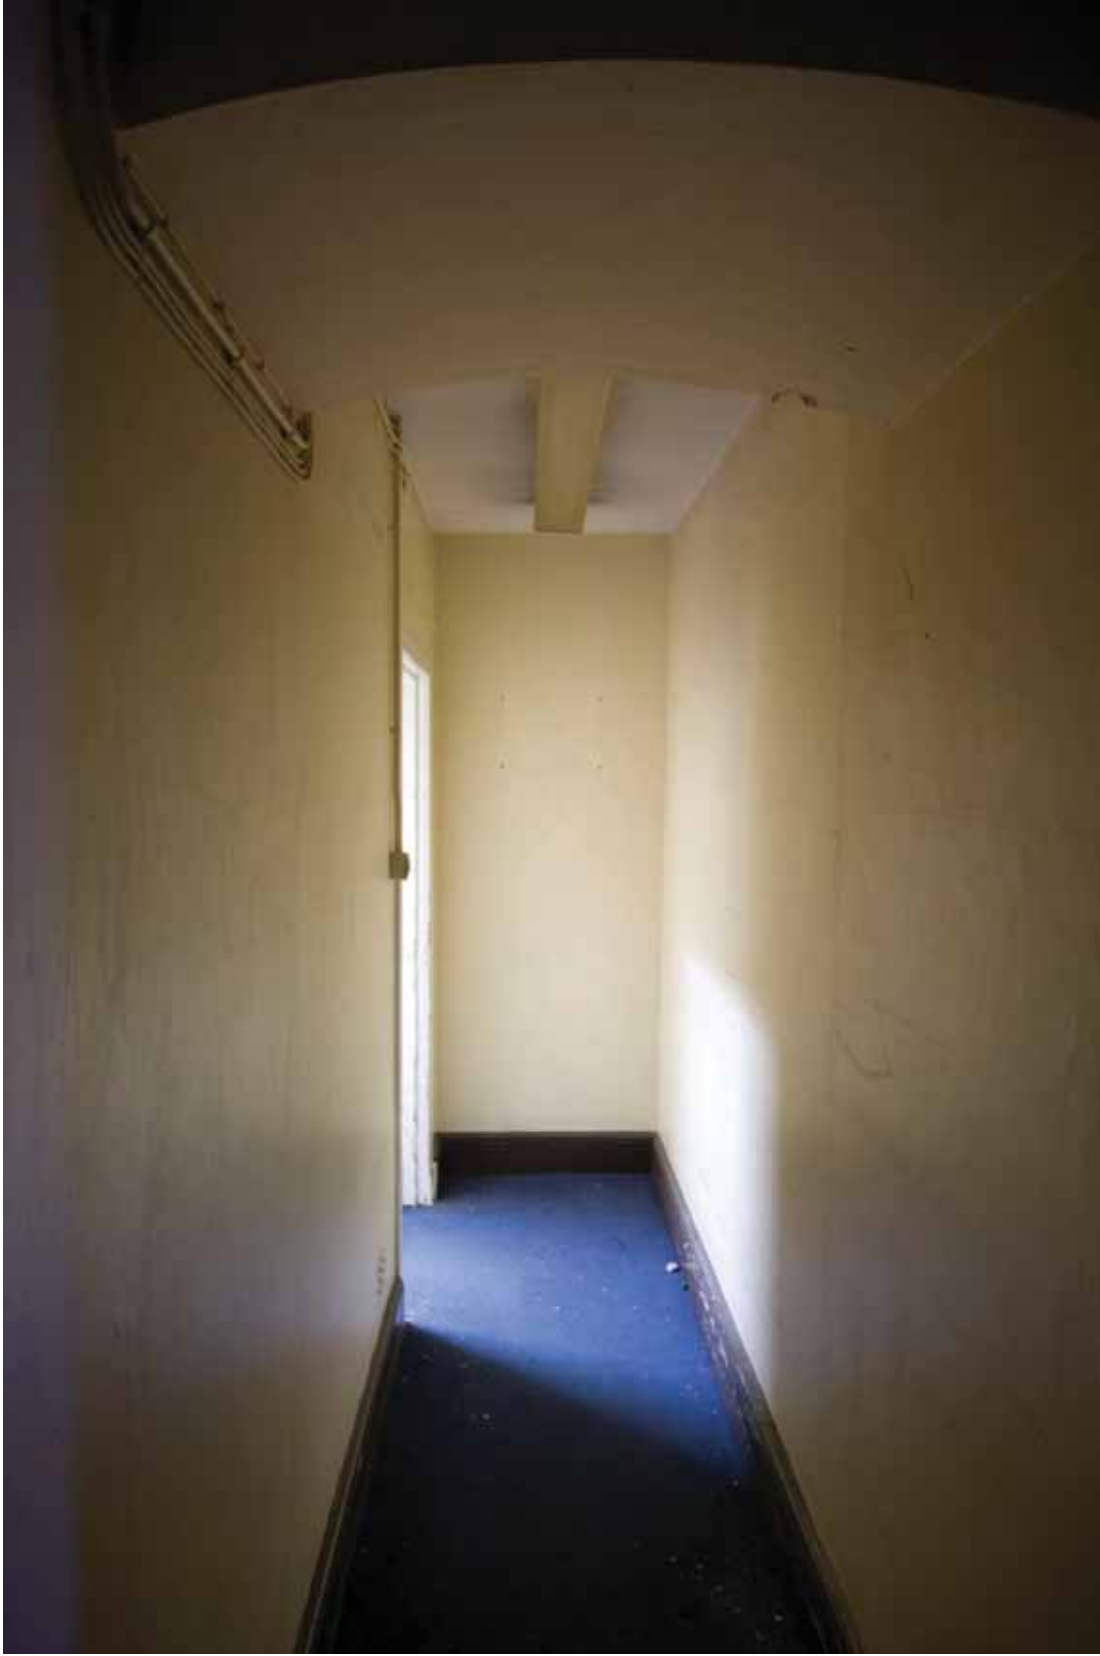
West (left) wall of Room M23 and north (centre) and east (right) walls of partition in Room M23, looking north (EAF10 LG100 1073)
